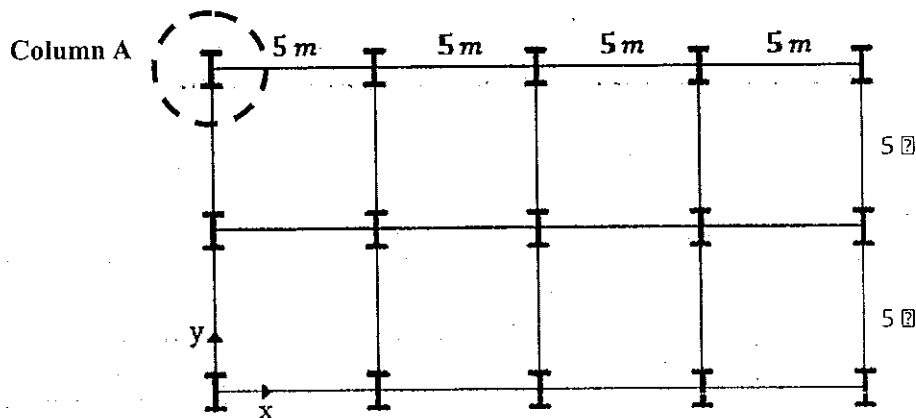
(a) Arrangement of beams and columns in a two storey office building
